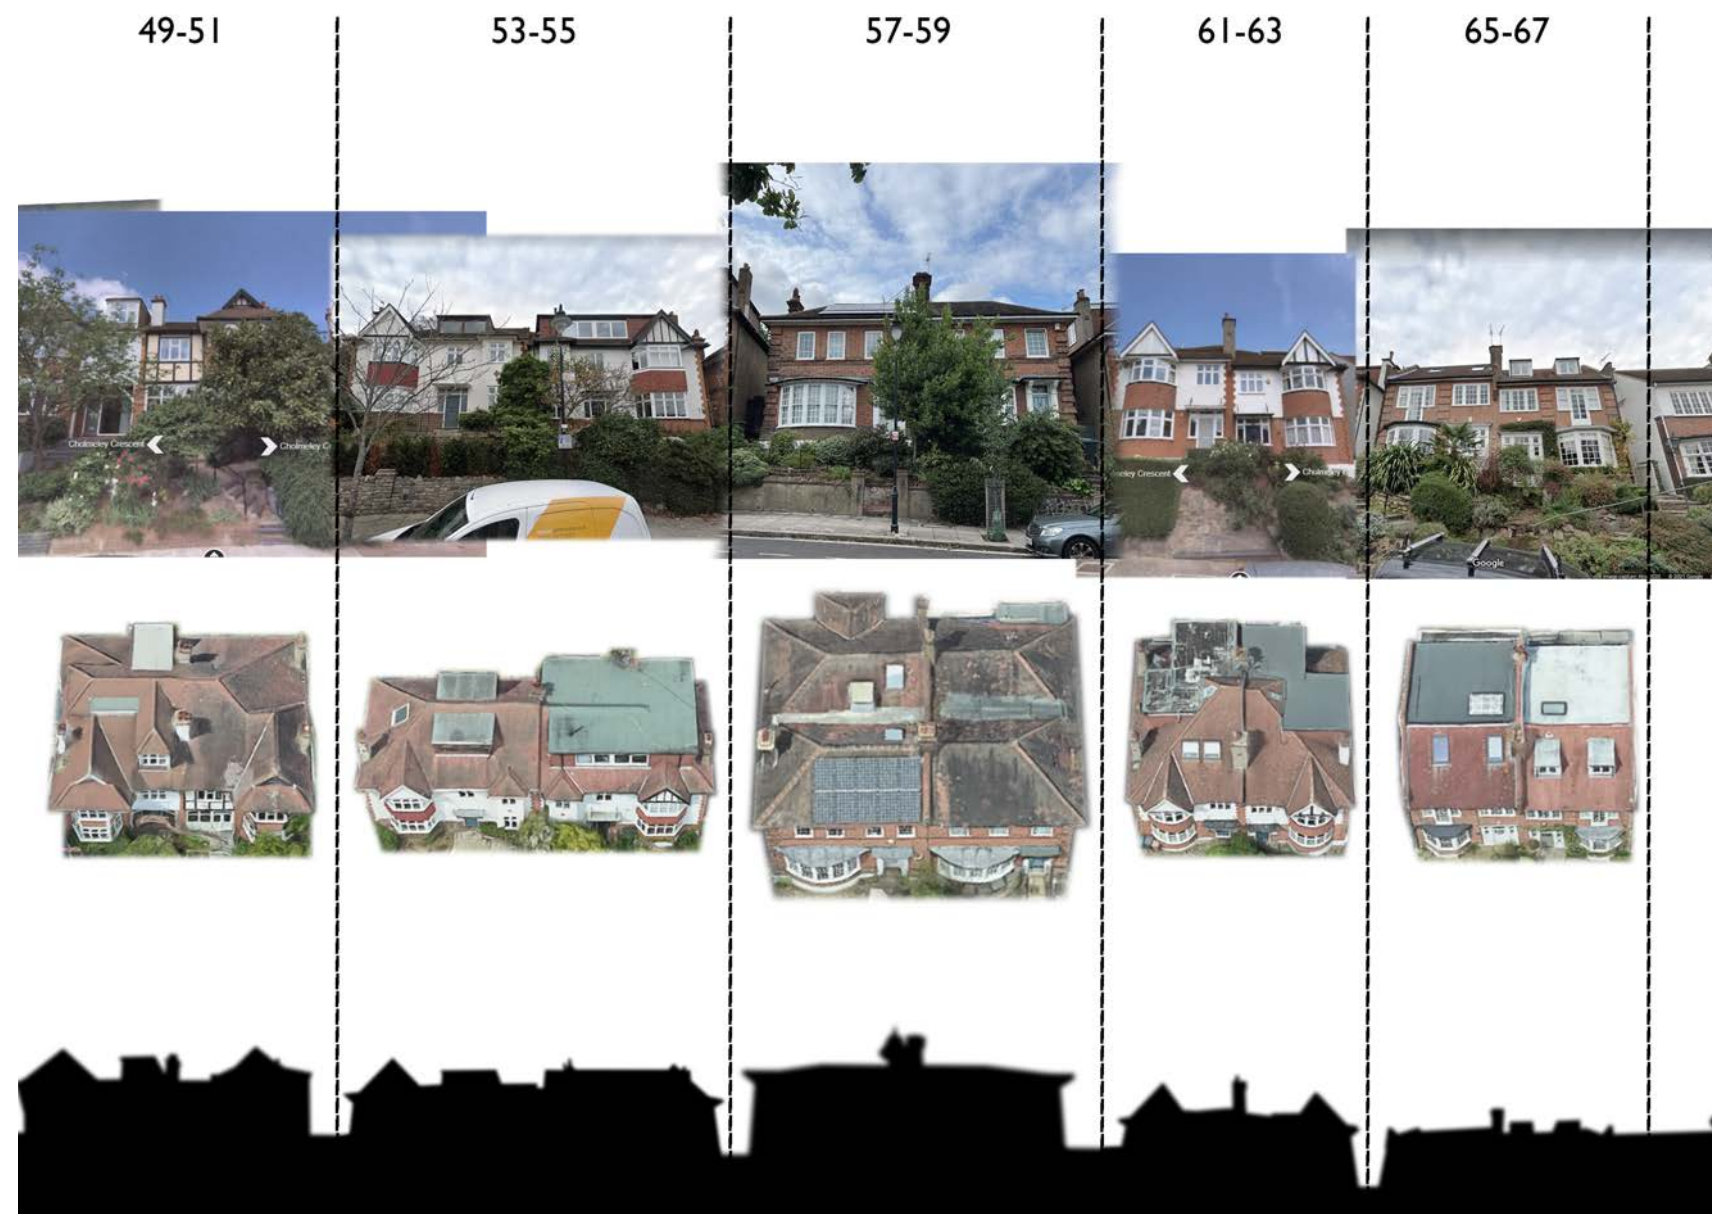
Variation in detailed design and roofscape within Cholmeley Crescent - centred on application site. NTS.
